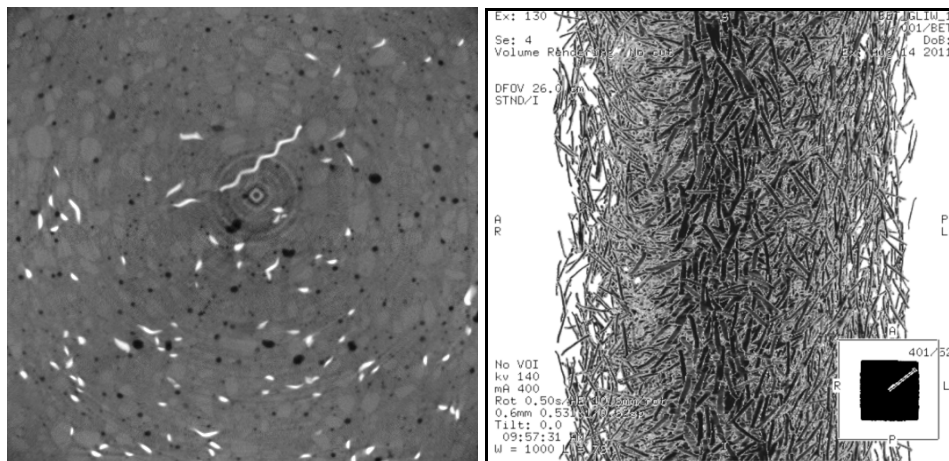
The X-ray sections of concrete beams with used steel fibres SW 35/1.0 (2D) and KE 20/1.7 (3D) for the sections of 400 ÷ 500 mm from the edge of concrete
